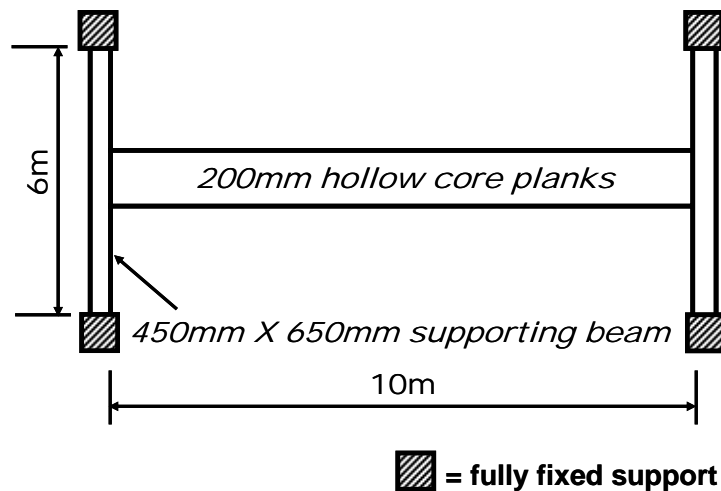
Schematic drawing of the hollowcore slab subassembly
